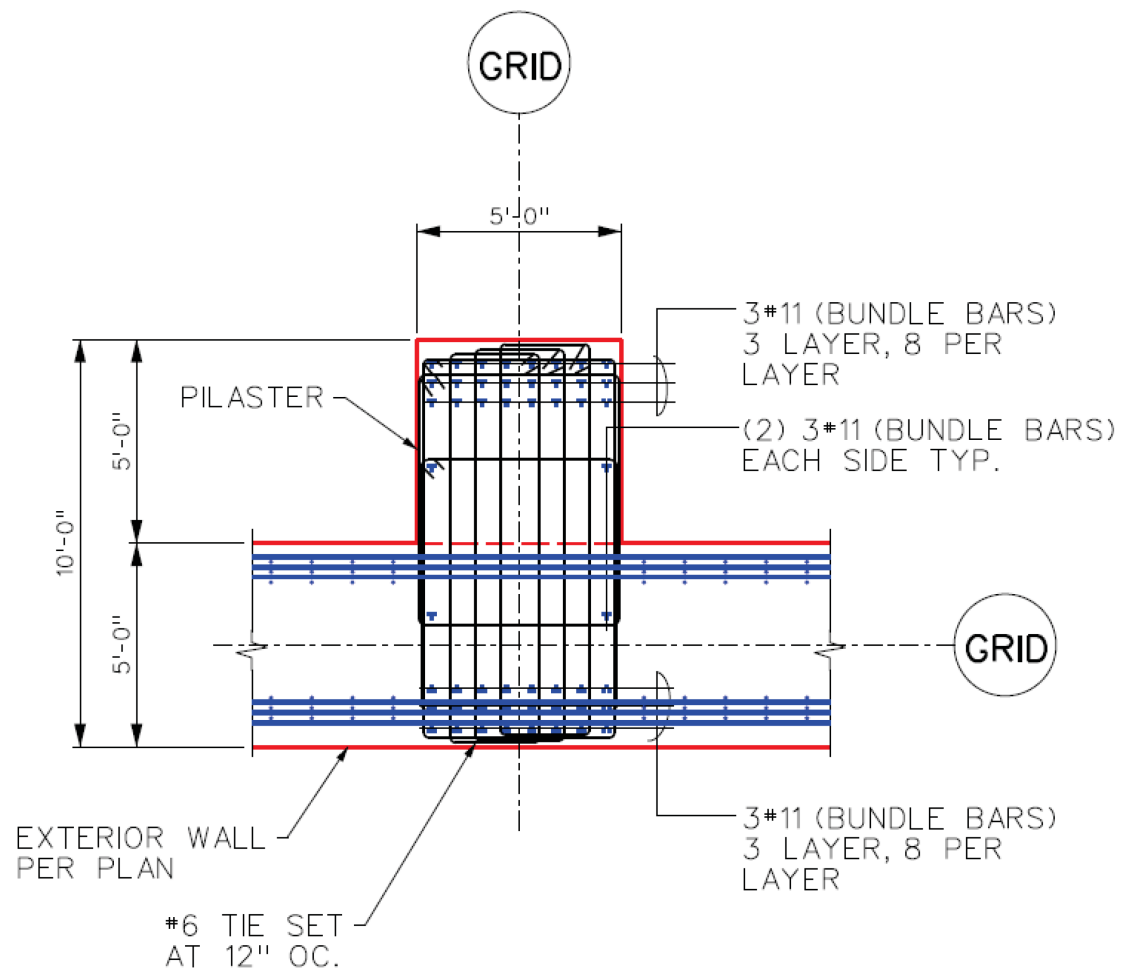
B-35: RXB Reinforcement Detail for Pilaster Type 4
